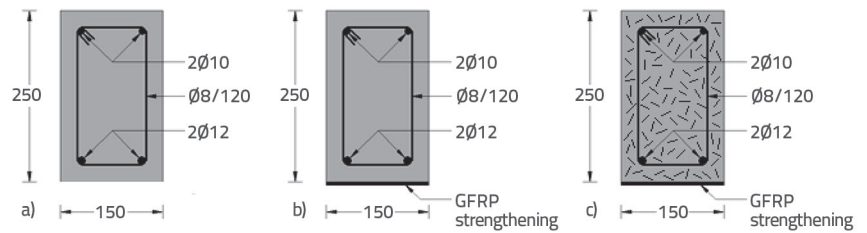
Beam details: a) Unstrengthened RC (control) beam; b) GFRP strengthened RC beams (RBL3 & RBL5); c) GFRP strengthened FRC beams (SF0.5L3, SF0.5L5, SF1.0L3, SF1.0L5, SF1.5L3 & SF1.5L5)
